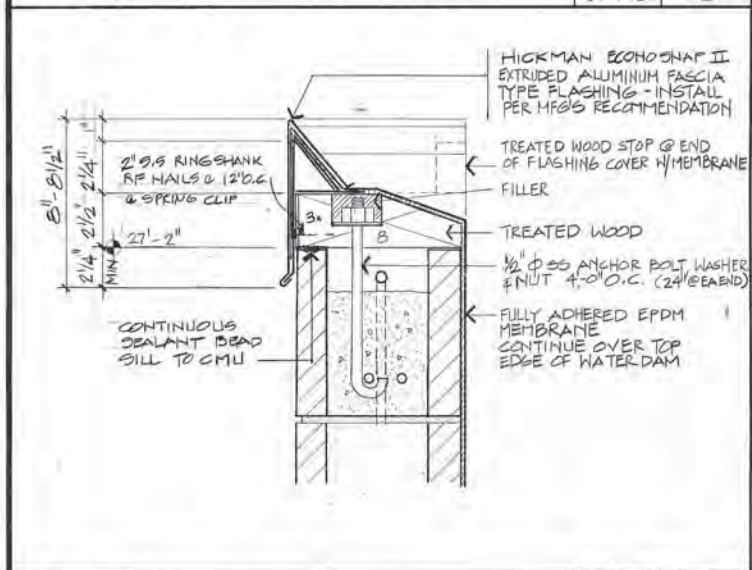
DETAIL - FLASHING & EXIST'G SCALE 3/8"=1'-0"
